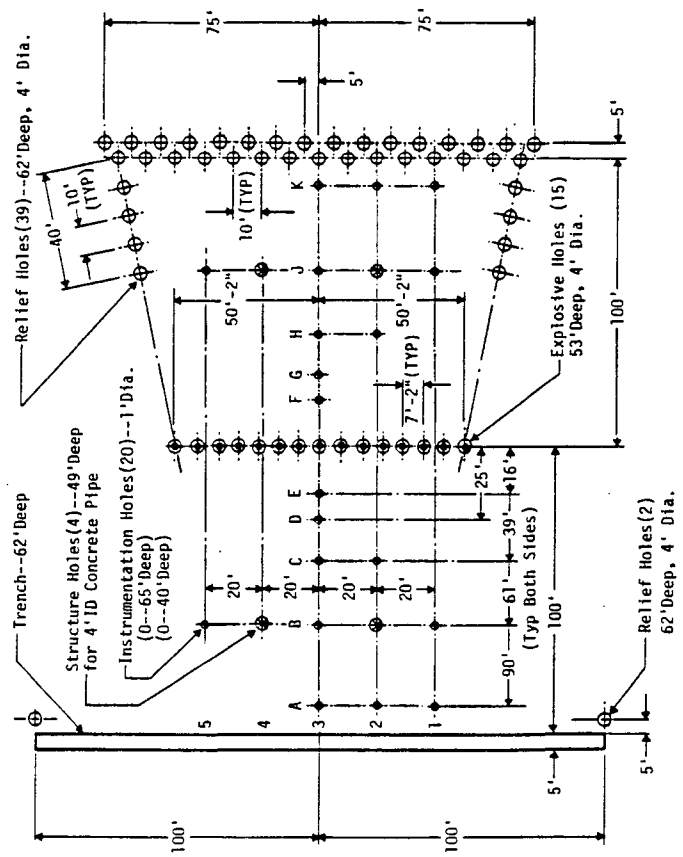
DIP IIIA Layout Showing Relief Trench and Relief Holes (Ref. 15).
